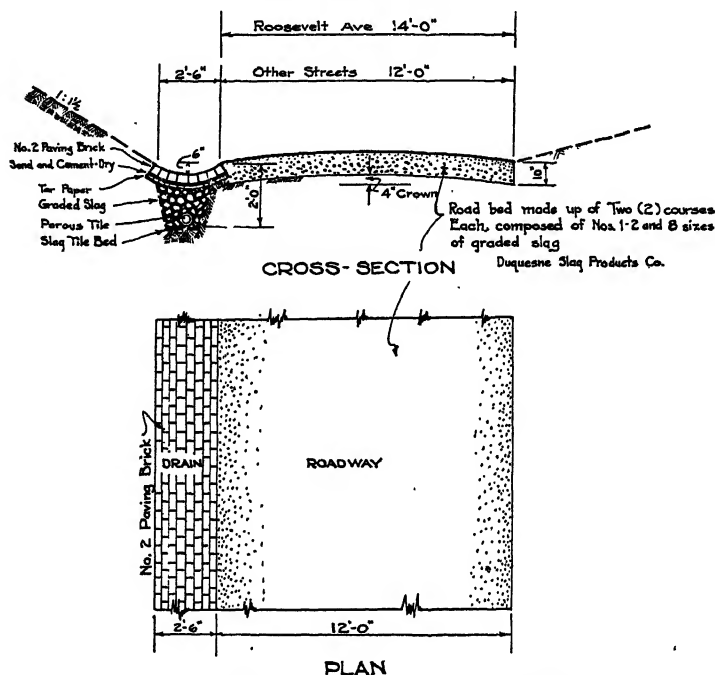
TYPICAL PLAN AND CROSS-SECTION OF NEMACOLIN ROADS.
